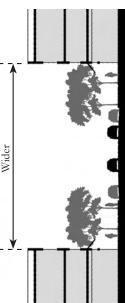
Buildings should not overwhelm the pedestrian experience on the street and should account for the relationship between building height and street width.
